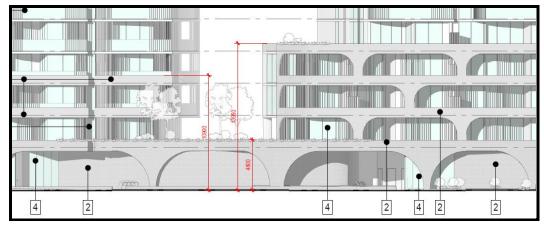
Proposed Street interface of the Development (Source: Jackson Teece, 17 June 2022)
